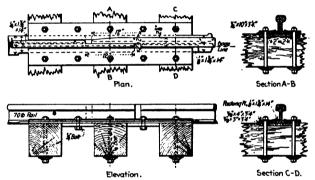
Expansion Rail Joint; Poughkeepsie Bridge.
